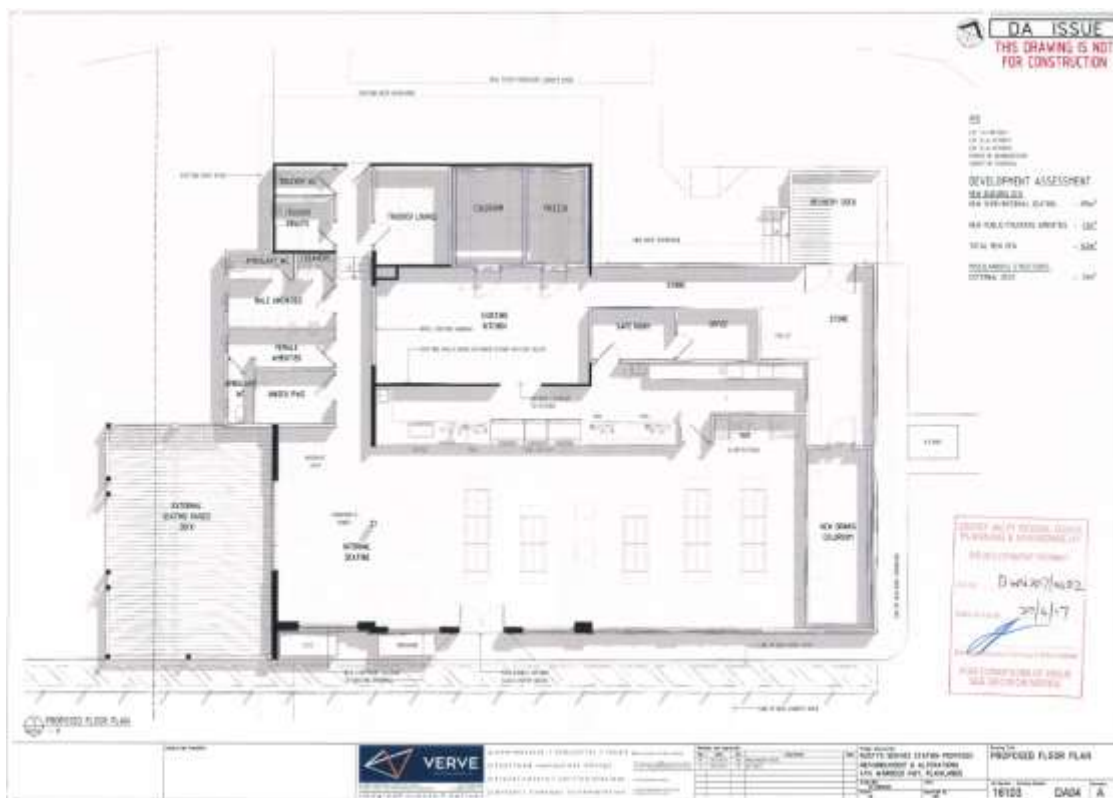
BWN2017/0002 approved internal floor layout plan.
